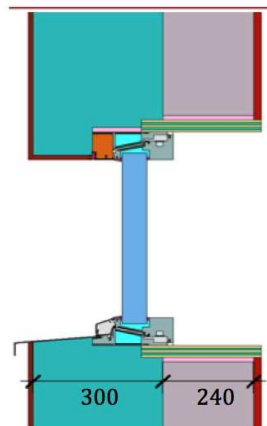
Proper installation of windows in the plane of the insulation.[67]
